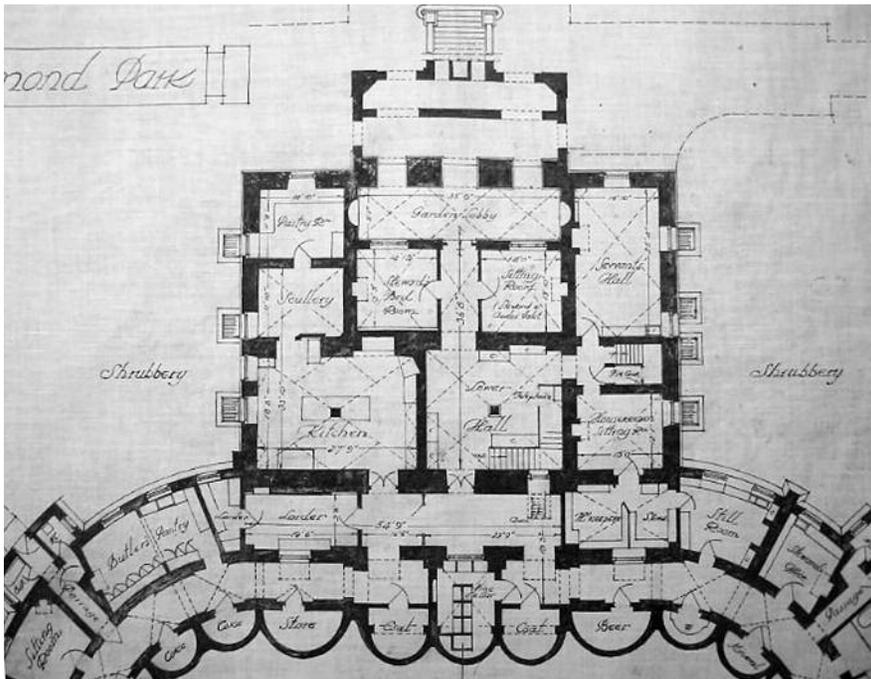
White Lodge: plan of ground floor, 1927. Allen Gilham.
